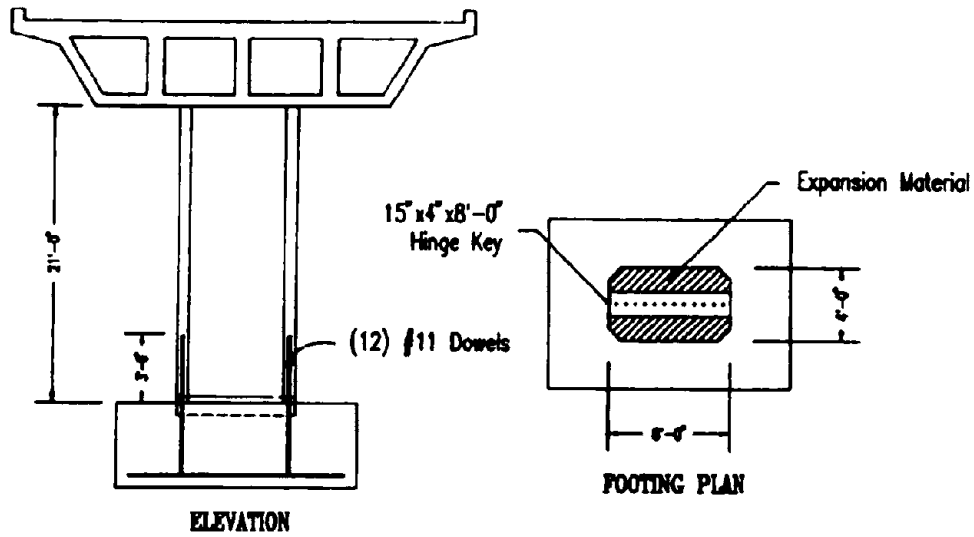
Rose Creek Bridge Bent Elevation and Hinge Cross Section.
